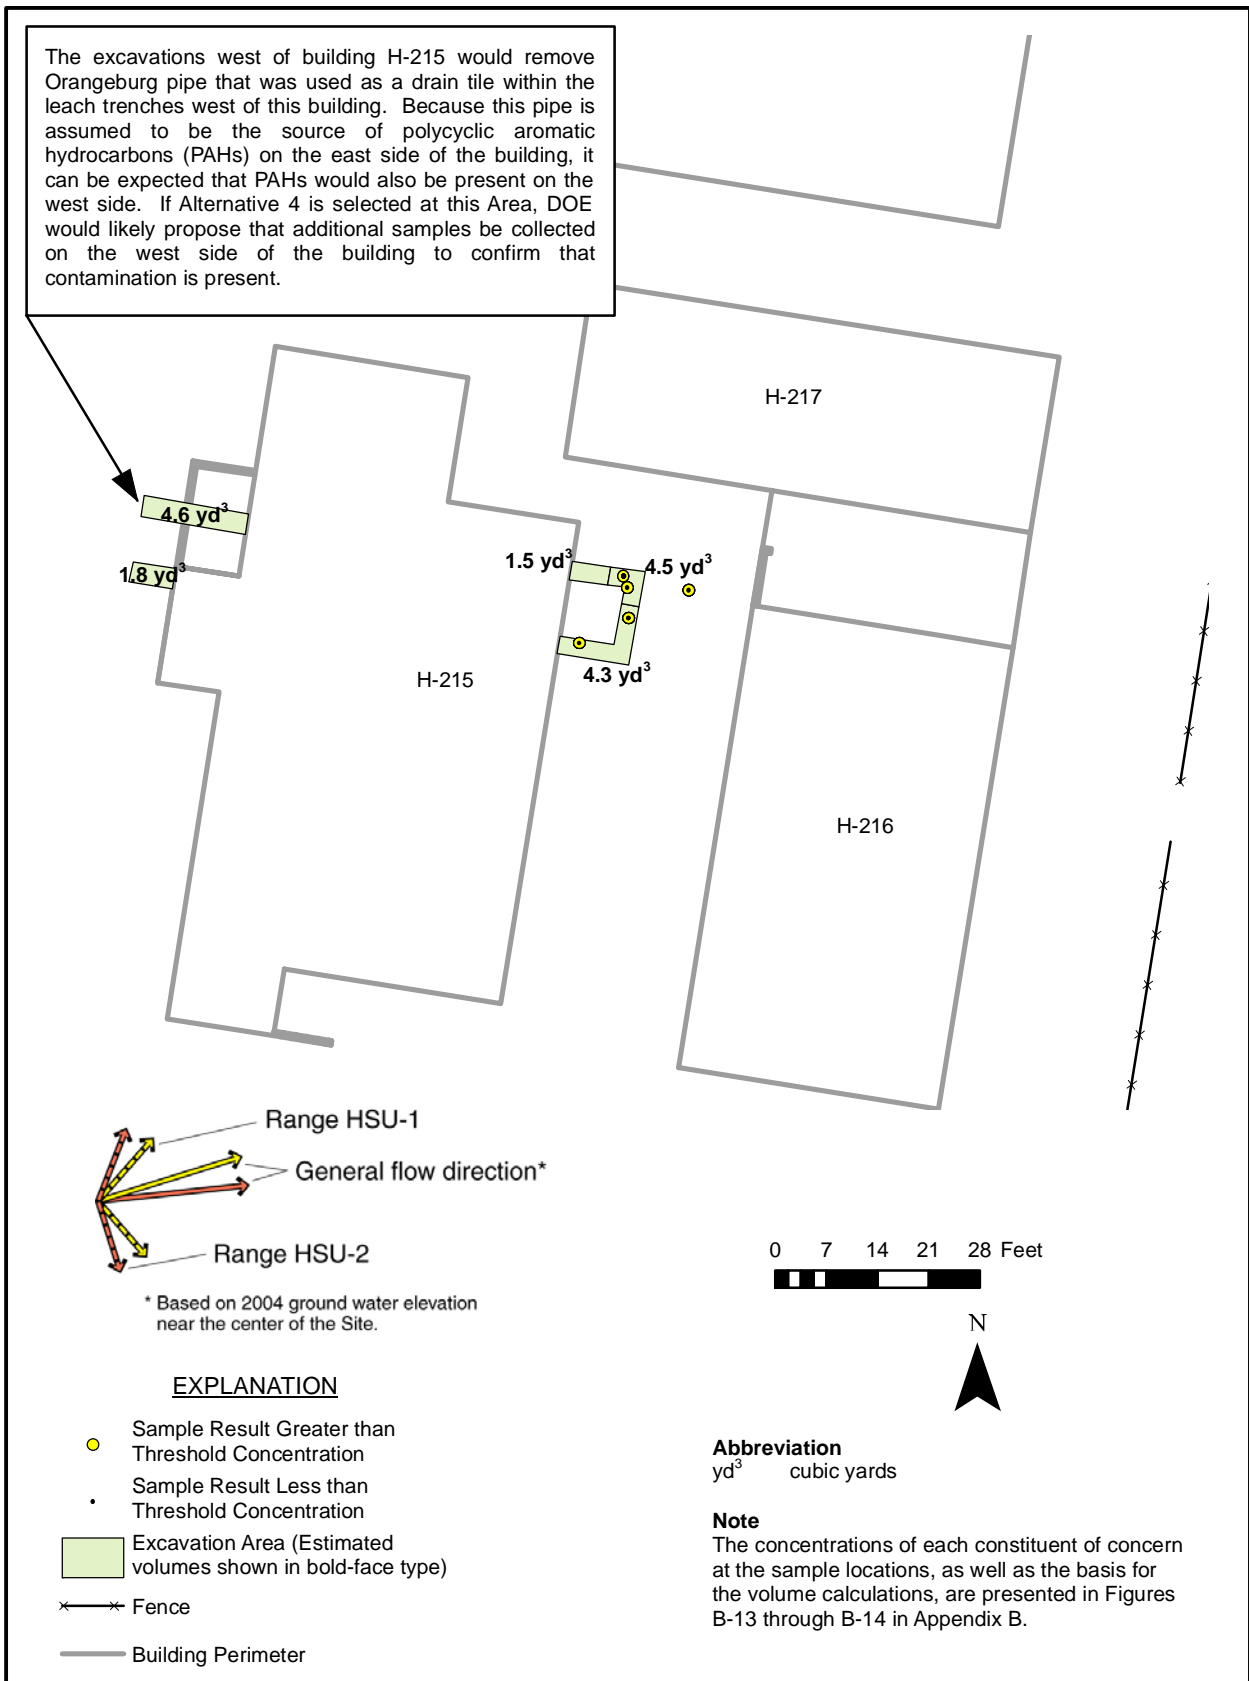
Alternative 4 at the Domestic Septic System No. 4 Area: Excavation Area
